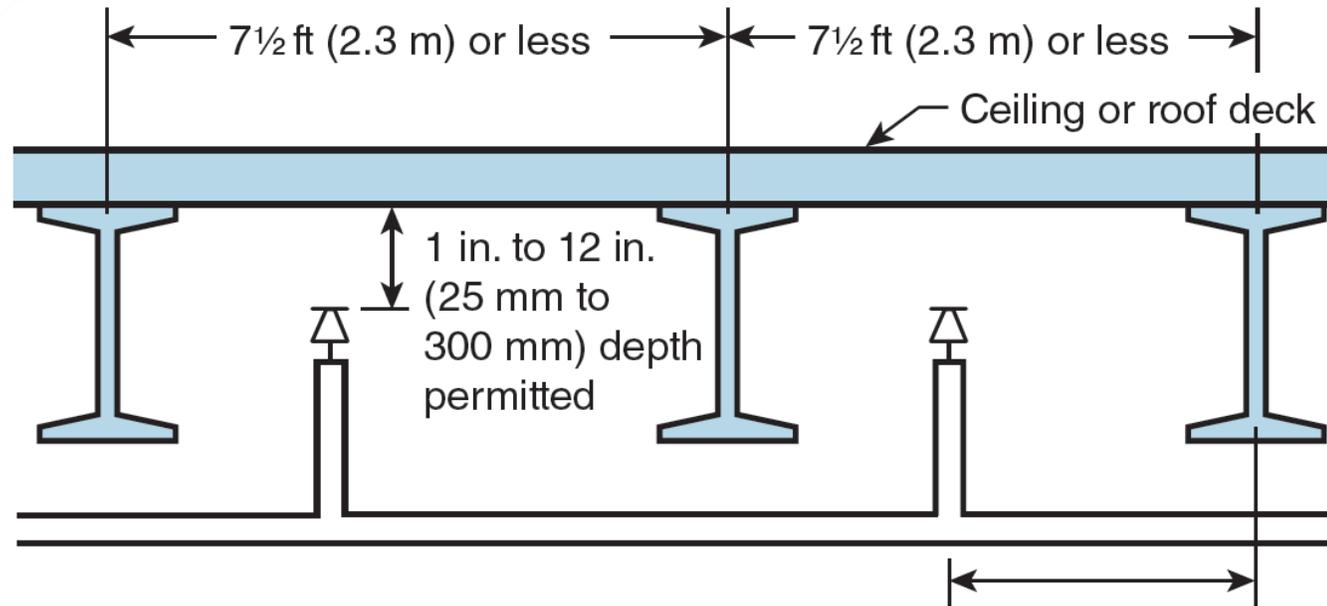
Placement of Standard Spray Upright Sprinklers Underneath Obstructed Construction with Sprinkler Deflector Positioned Above Bottom of Structural Member. NFPA13-2016
